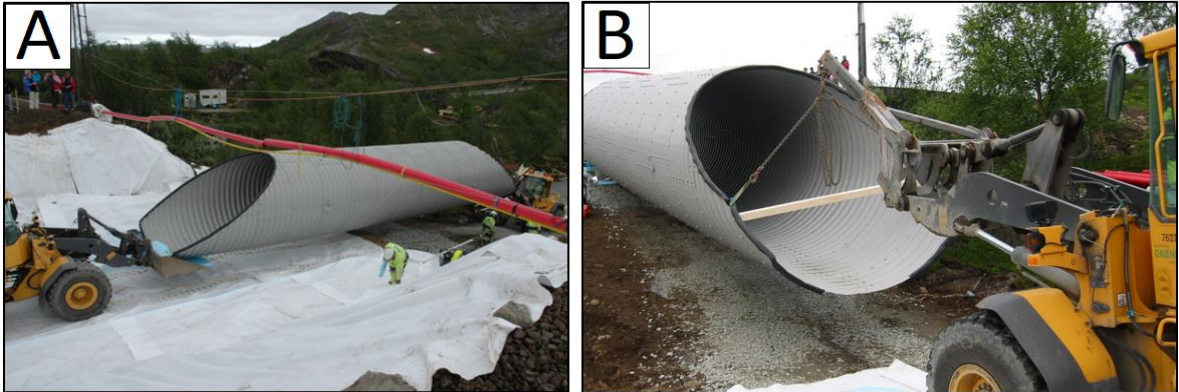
Installation of Solheim culvert in 2009 with wheel loaders at Ofofbanen railway line. The culvert had a circular cross section and a diameter of 3.0 meter (Source: Viacon Norway)
